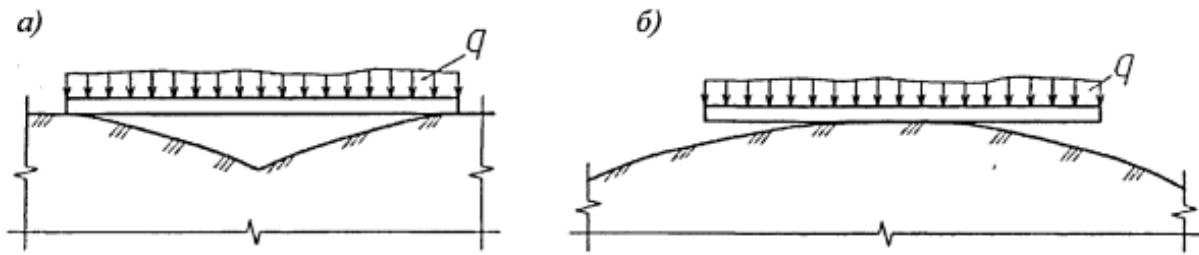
Design diagram of a strip foundation for cases of swelling of foundation soils under the end sections (a) and under the center (b)
